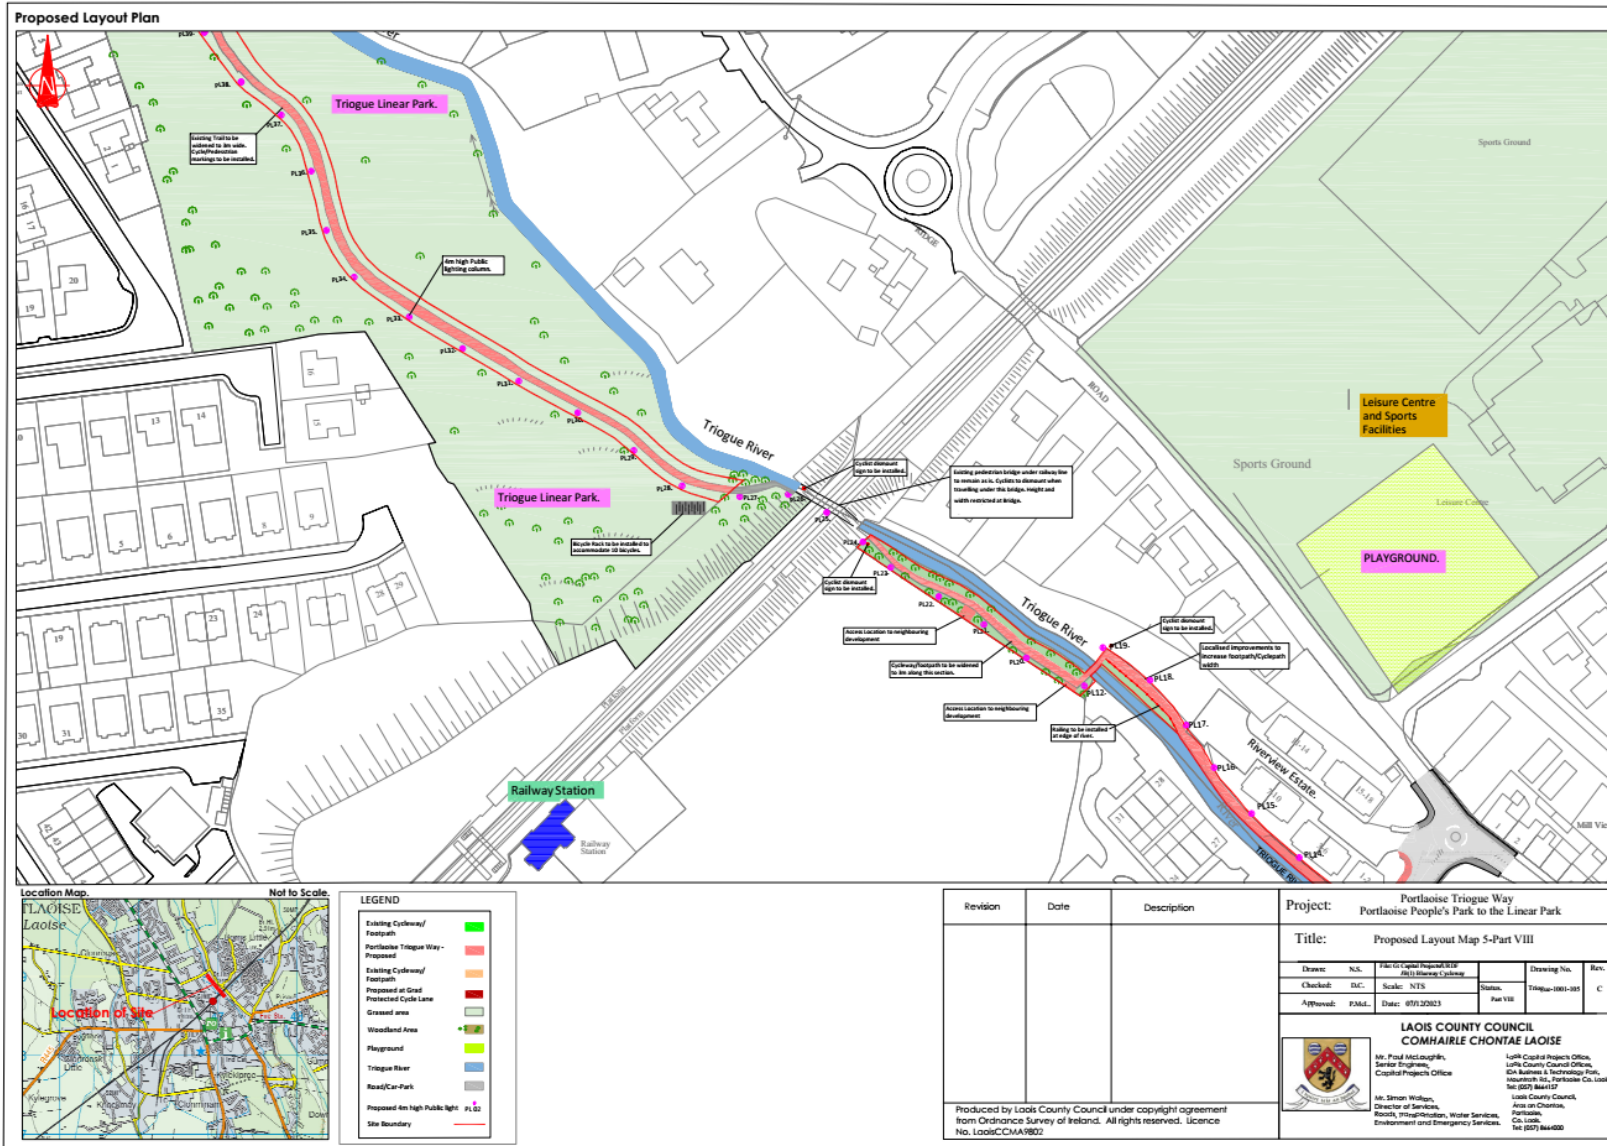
Proposed Scheme Layout (5 of 6)
